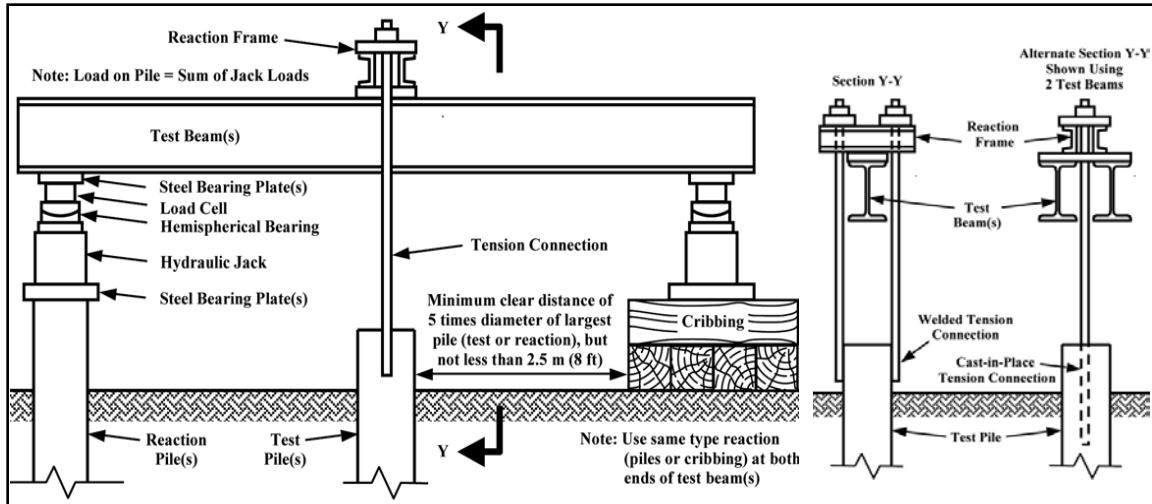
Typical setup for tensile load test using hydraulic jacks acting upward on both ends of test beam(s) (ASTM D3689 – 07).
